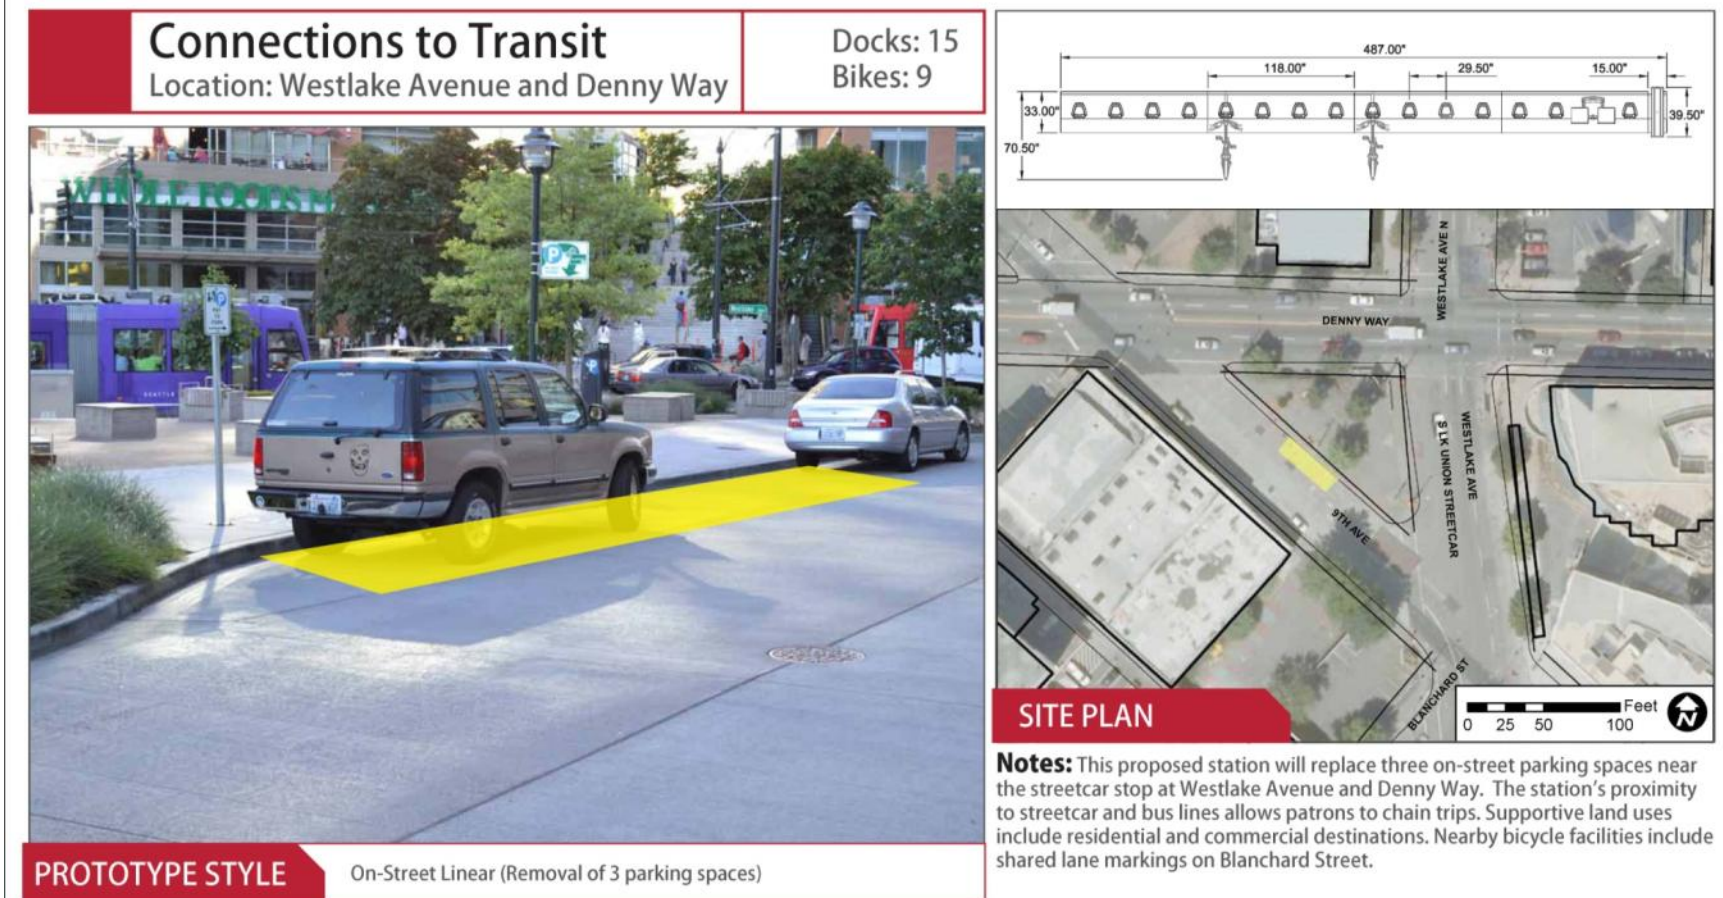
Station Example – Connection to Transit (Westlake Avenue and Denny Way).
